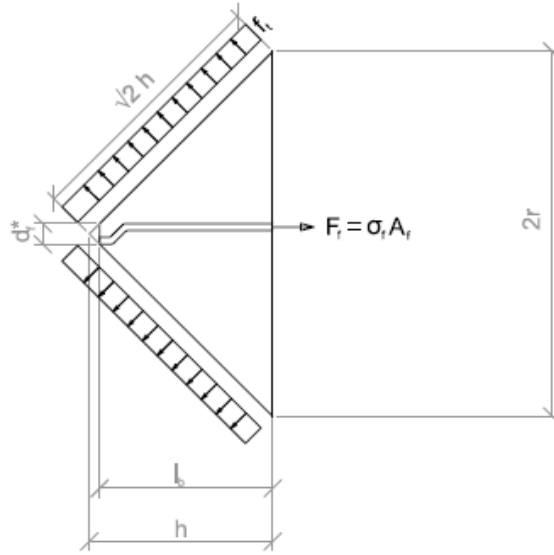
Calculation model for cone-shaped concrete failure
